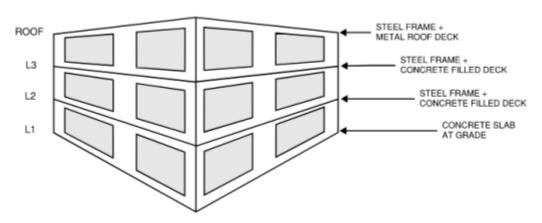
Three Story Building for Horizontal Gravity System, courtesy SE 2050
